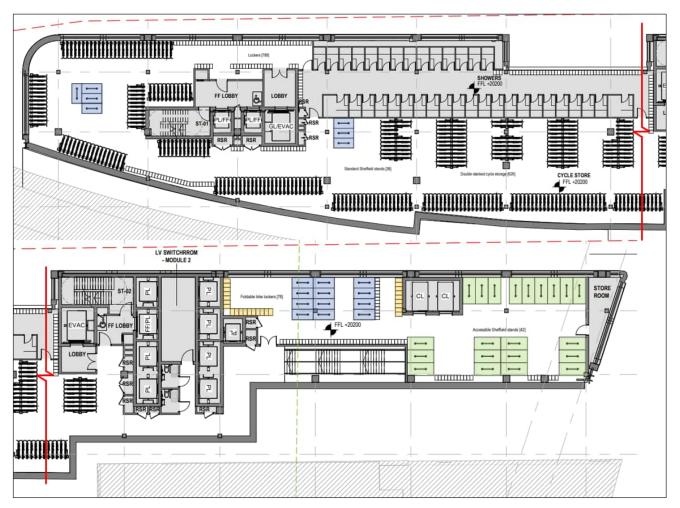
Proposed long-stay cycle parking layout at Level 01
